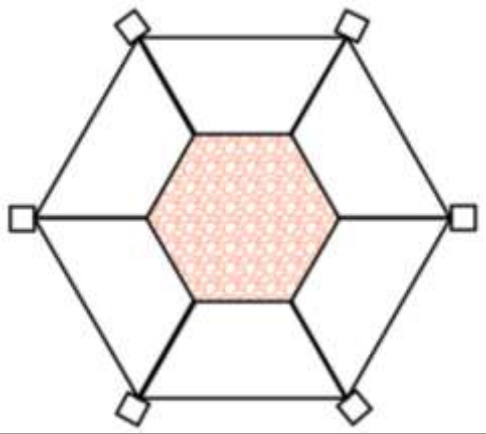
PLATE C: SHOWS THE ENTRANCE FOYER CEILING OF BABBANN GWANI
